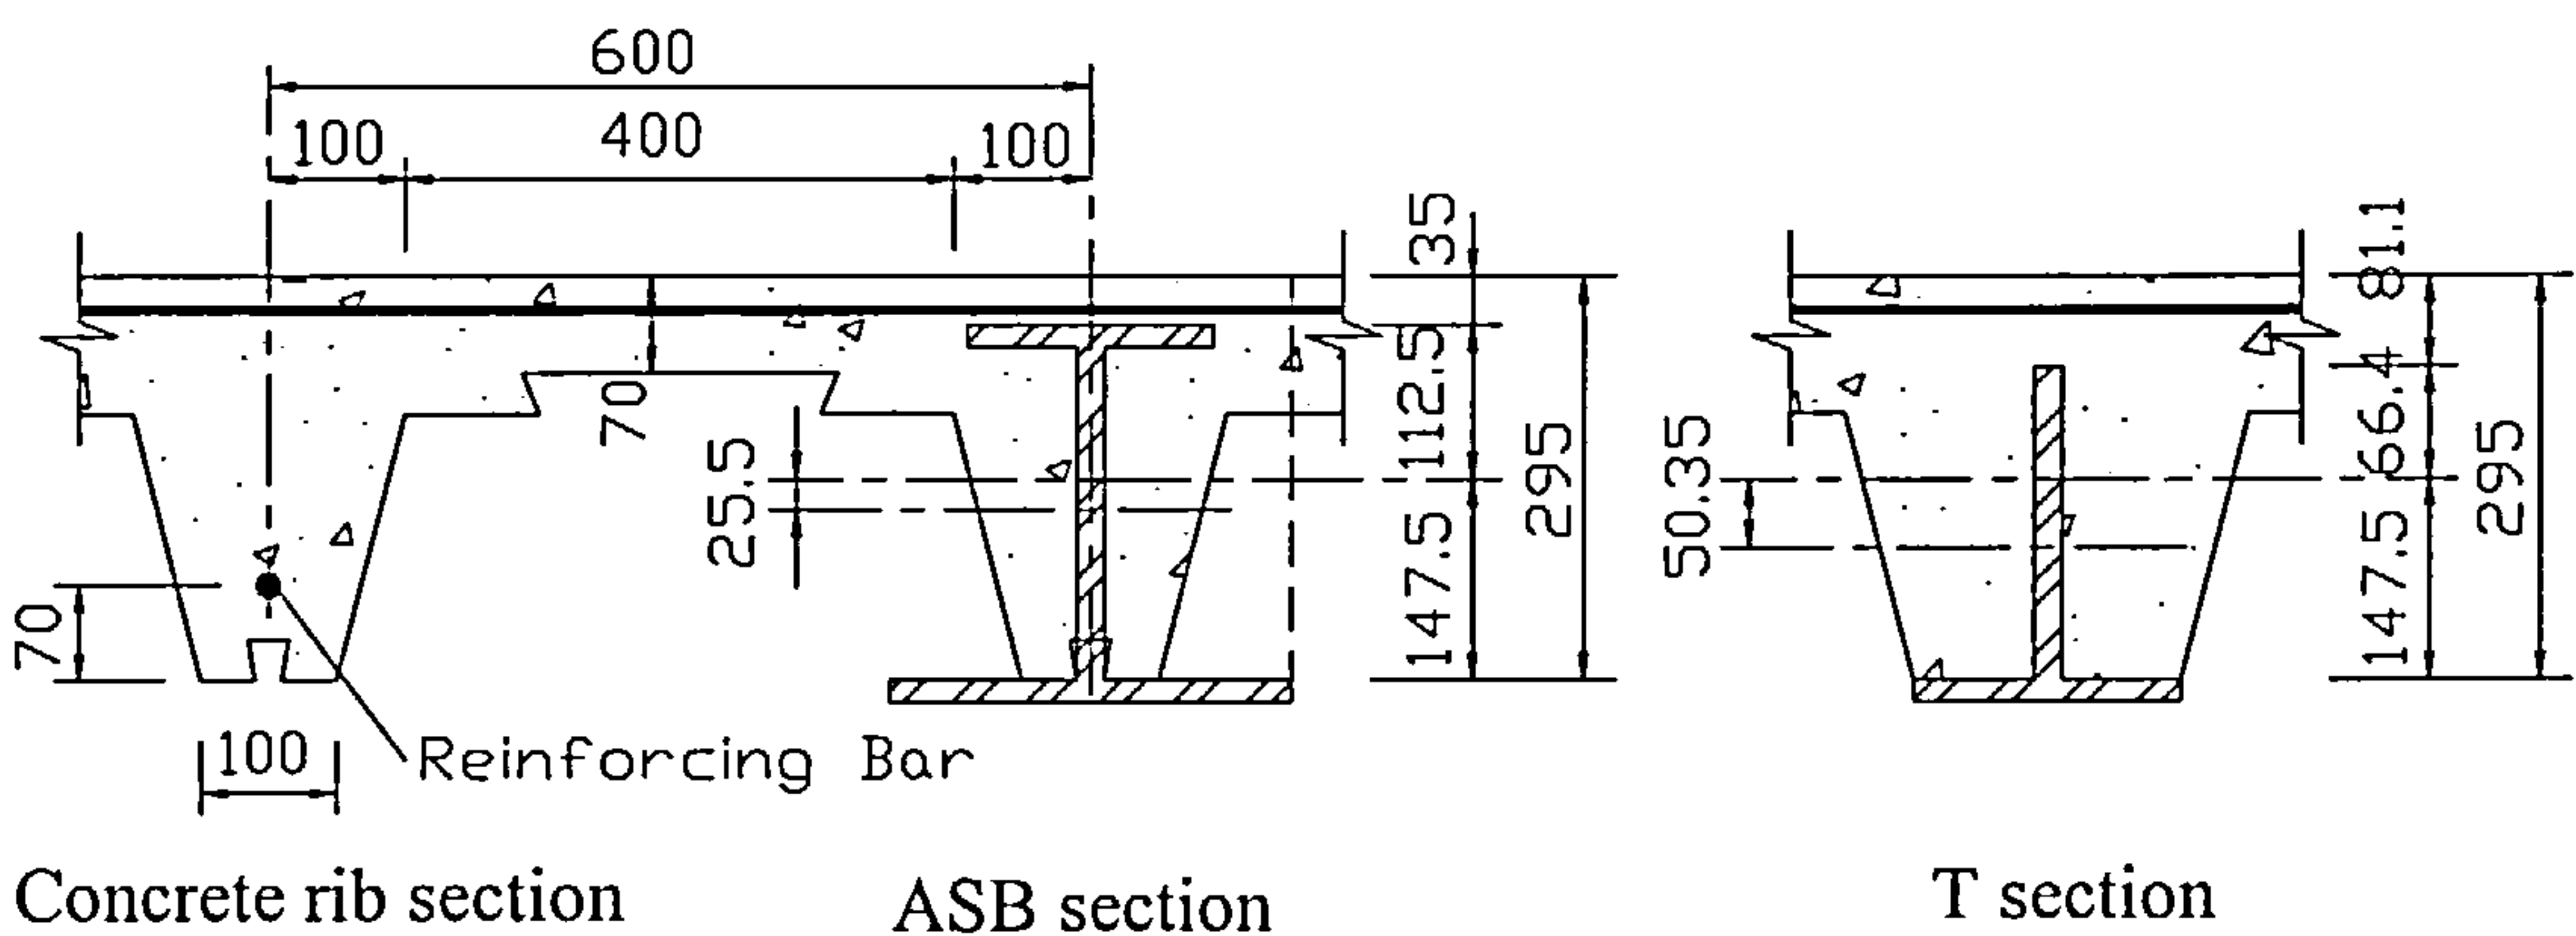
A composite Slimdek floor section in the Full Scale Fire Test for computing.
